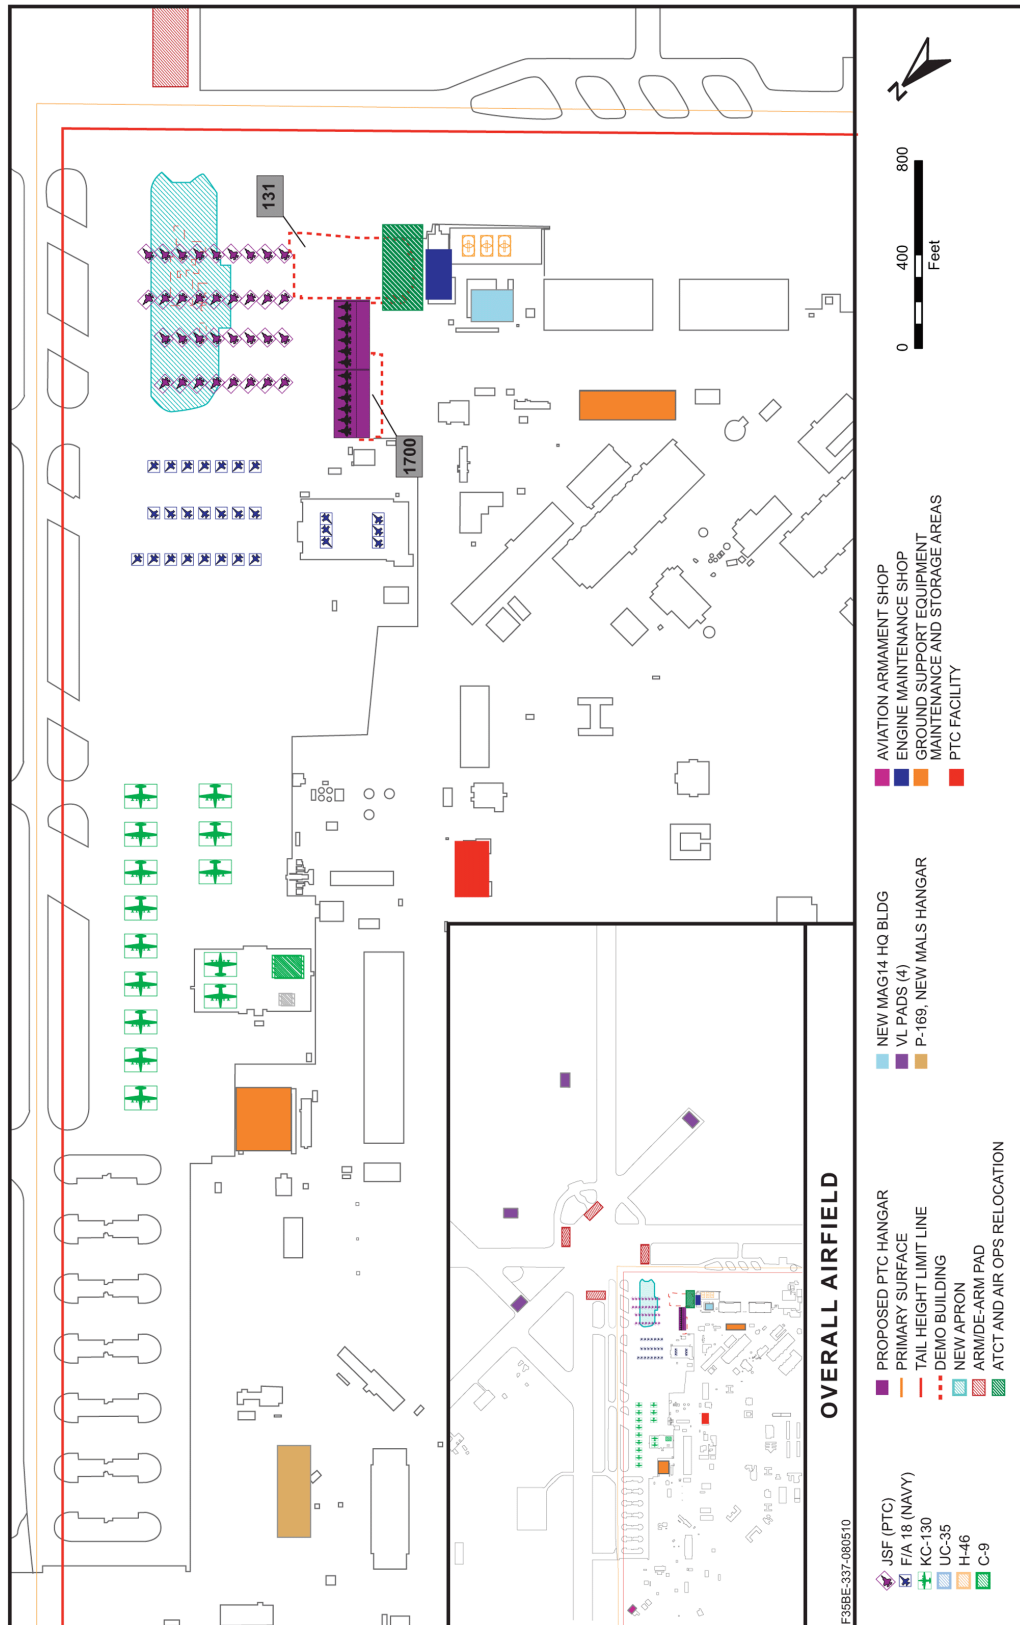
MCAS Cherry Point Proposed Flightline Construction and Support Facilities under Alternative 2
